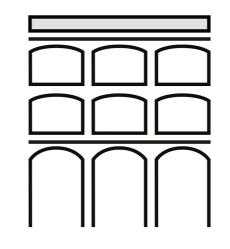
Building façade detail on Electric Avenue
